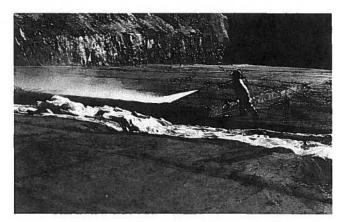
Water jet blasting surface of conventional concrete foundation leveling pad prior to RCC placement at Upper Stillwater Dam, Utah.
